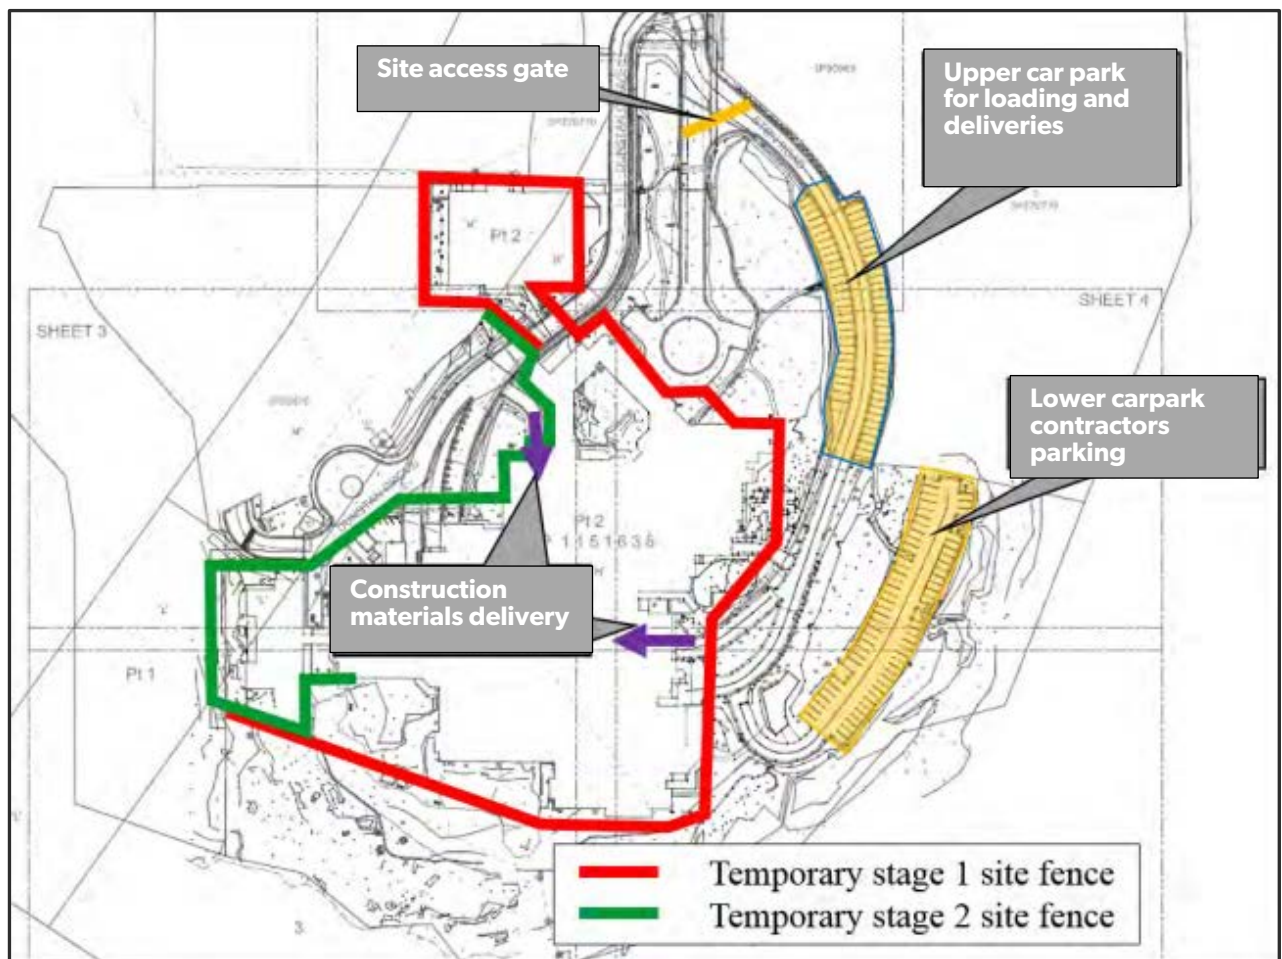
| Construction traffic management (Source: Applicant's EIS)
